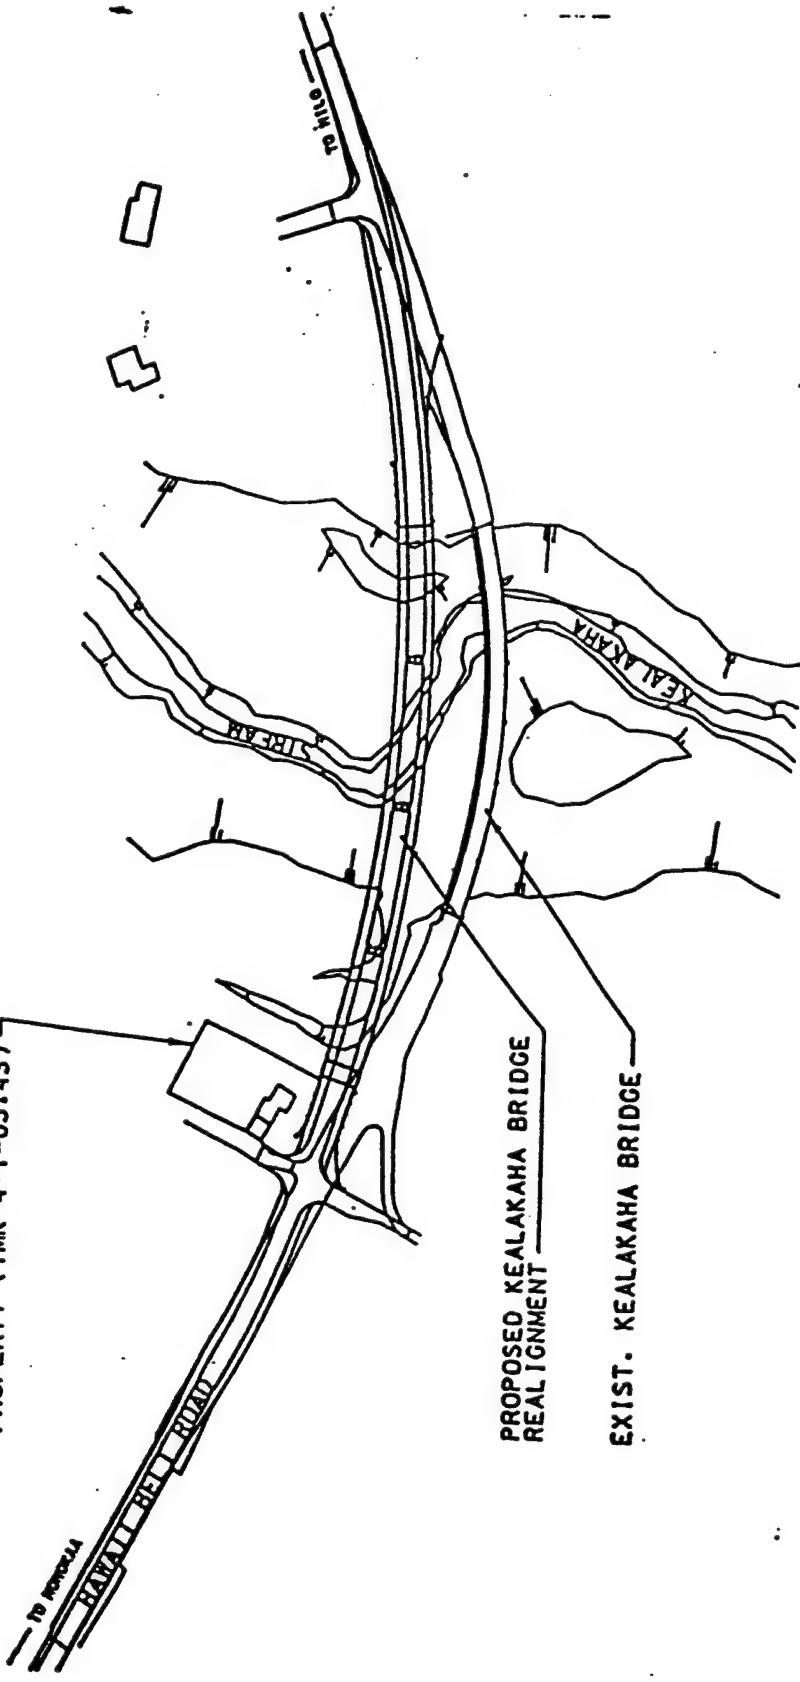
Existing and Proposed Kealakaha Stream Bridge Alignment
